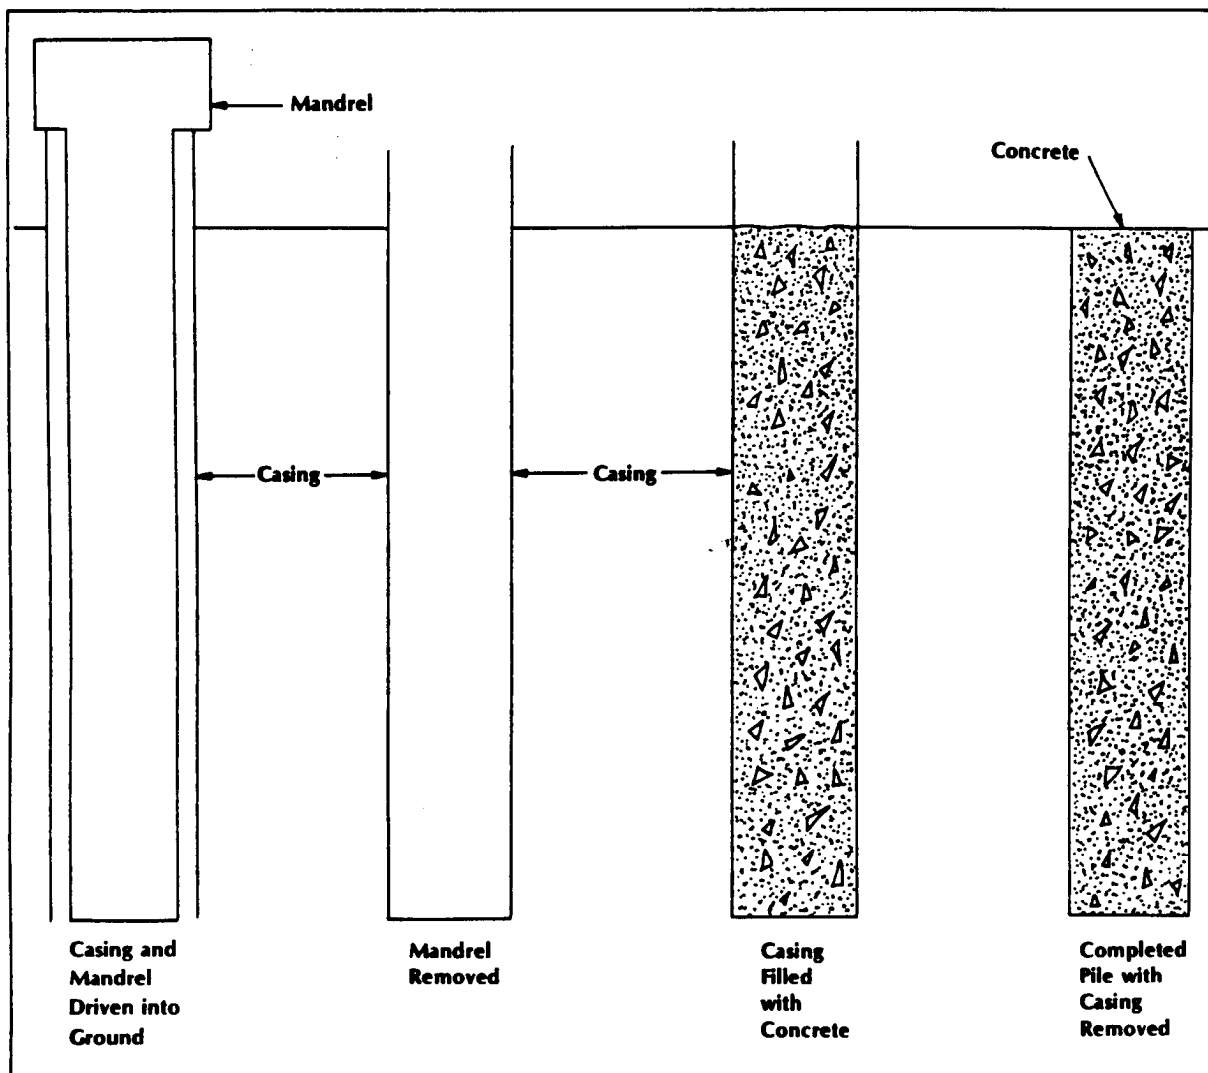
Procedure for placing cast-in-ground concrete piles
